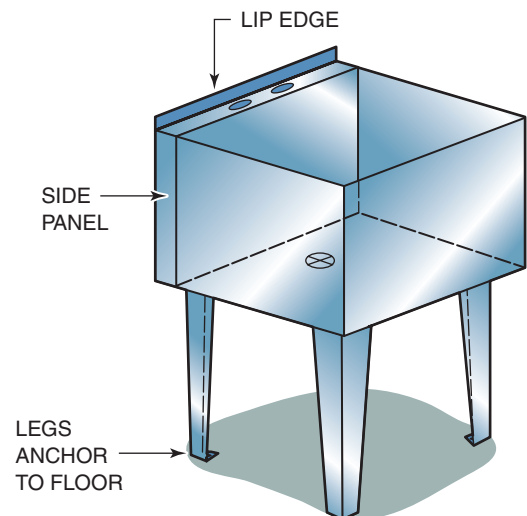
A laundry sink is installed in a washing machine area or a utility area.
